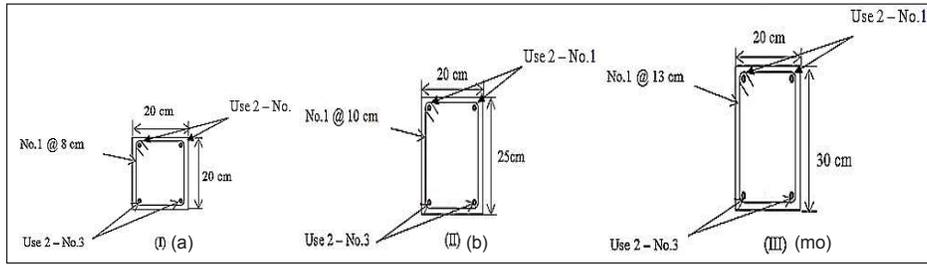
Cross section detailing for beam s: (a) Type I, (b) Type II, and (c) Type III
